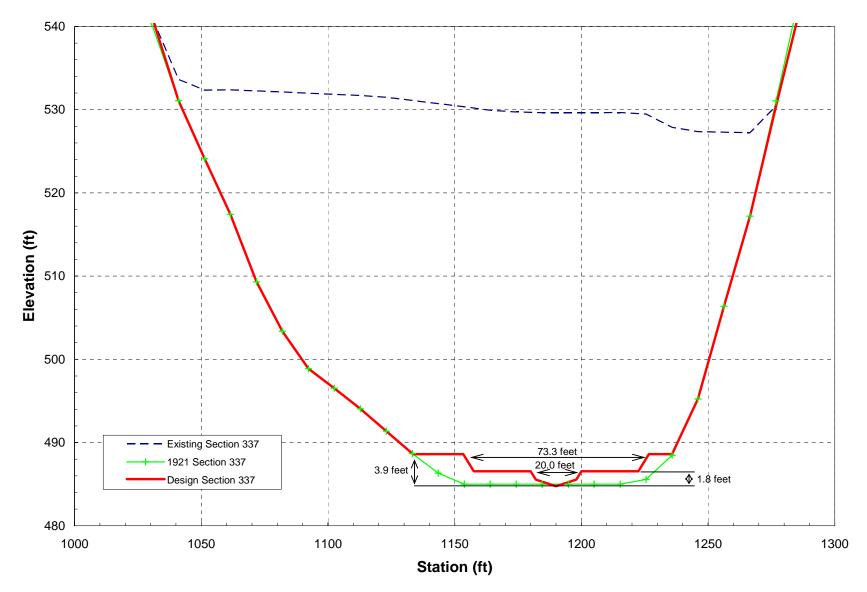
Typical cross section and design channel geometry for the reconstructed reach of the Carmel River Branch under the Complete Dam Removal Alternative.
